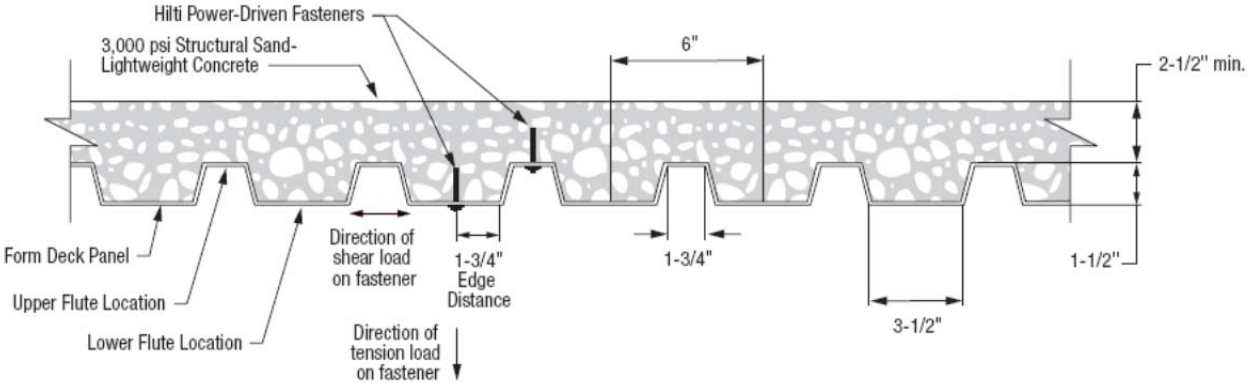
HILTI FASTENER LOCATIONS IN 1 1/2-INCH-DEEP COMPOSITE FLOOR DECK PANEL, NORMAL DECK PANEL PROFILE ORIENTATION
